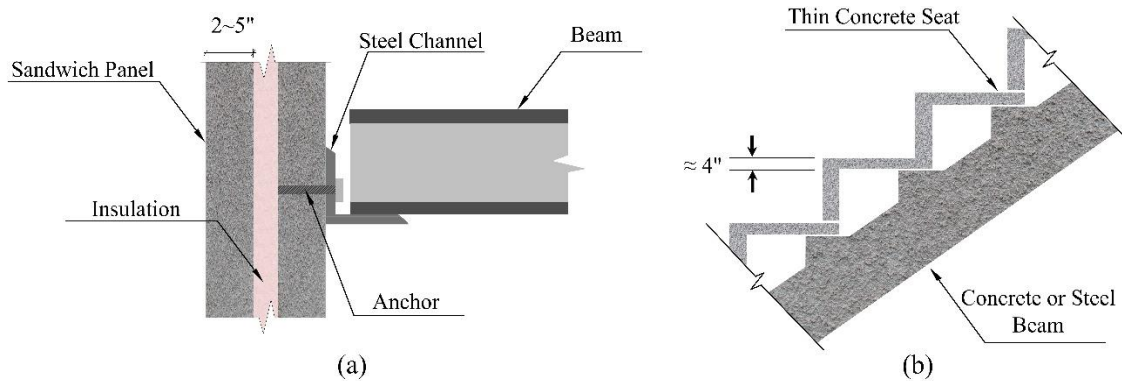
Thin concrete layers (a) Sandwich panels (b) Stadium seating.
